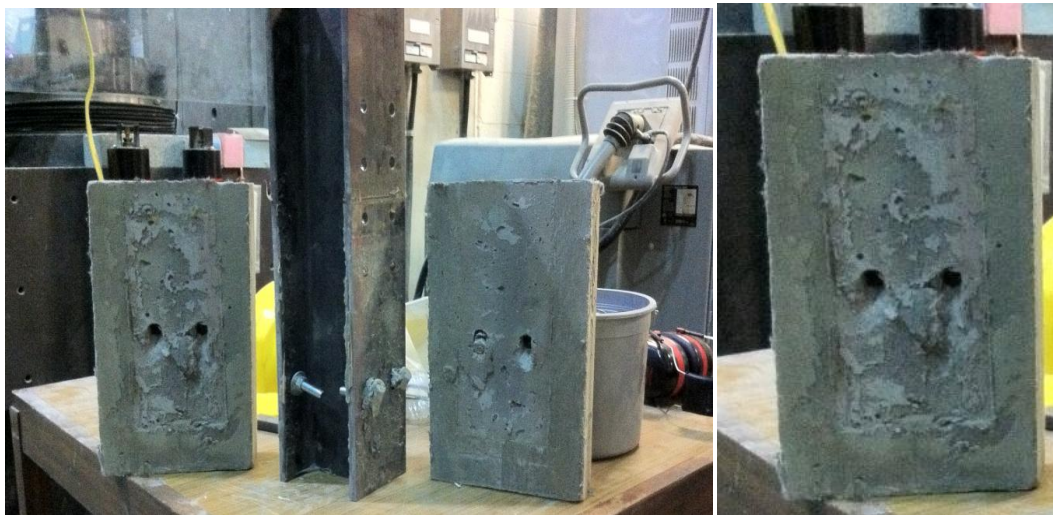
ECC specimen after test showing ductile failure mode (crack width is approximately 40 μm). microcracks observed on (a) outside and (b) inside of the specimen.
